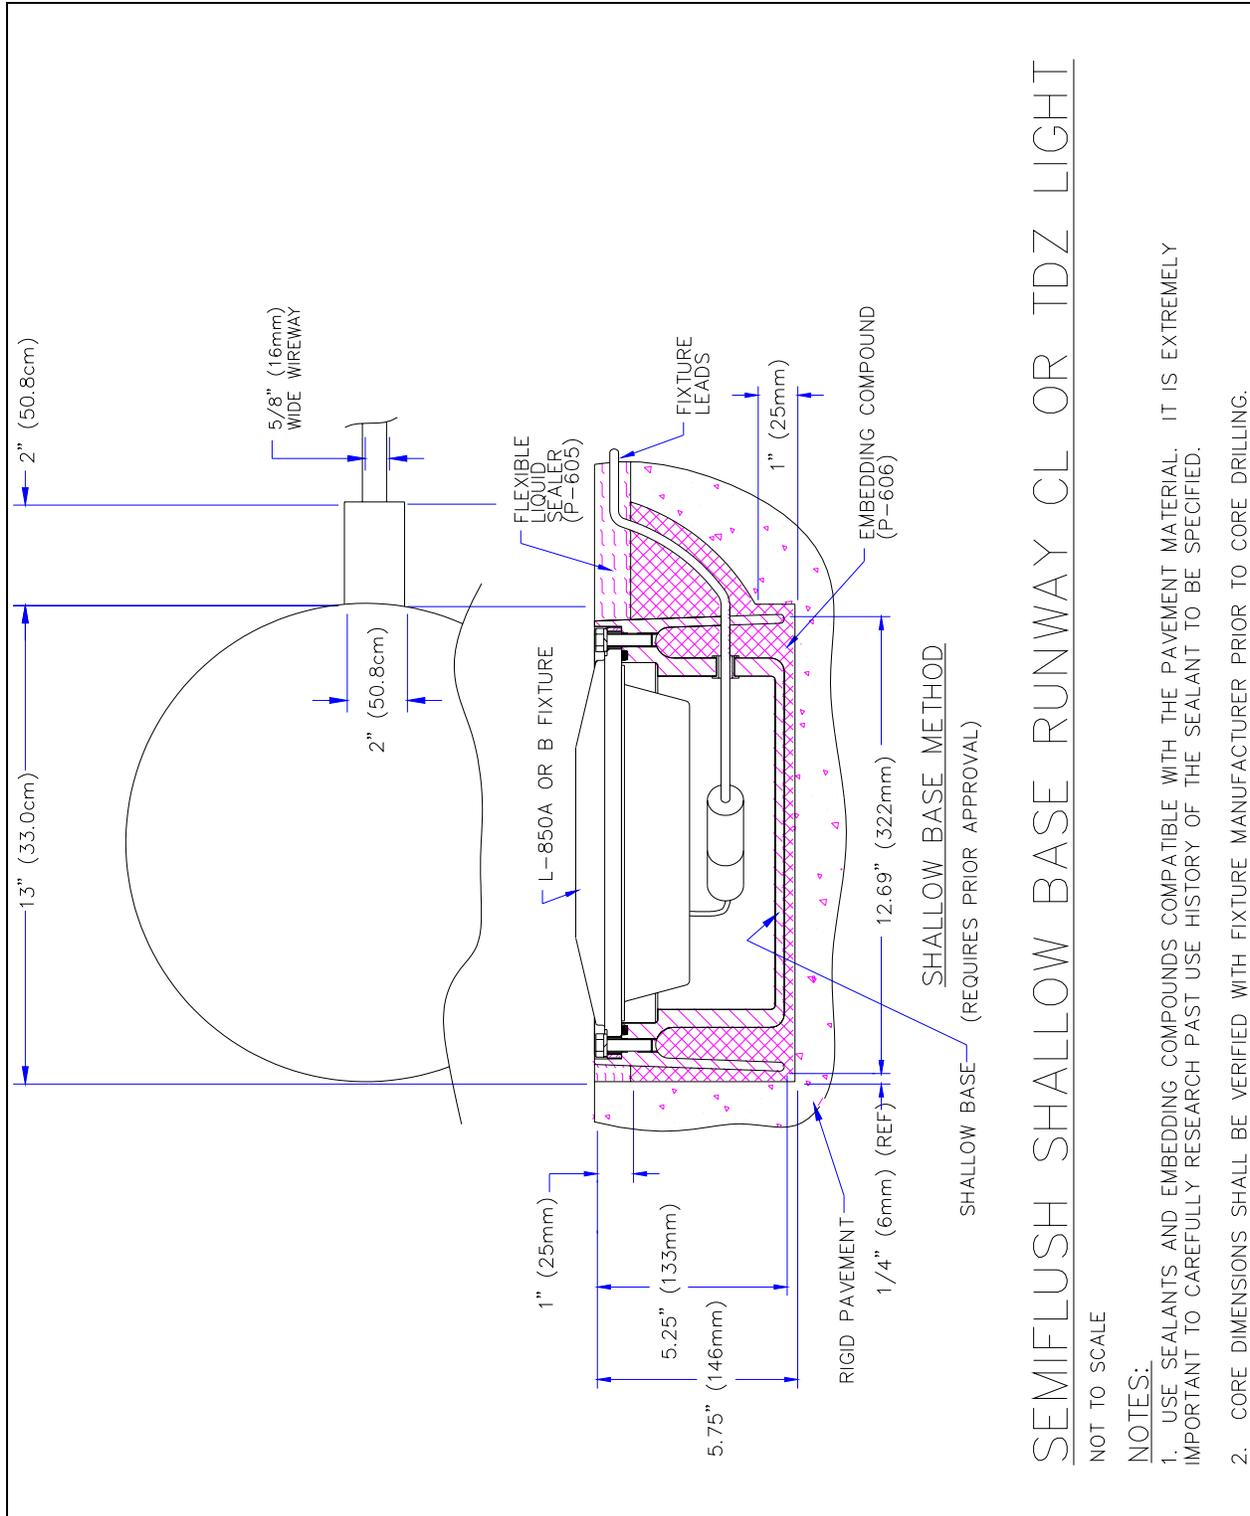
In-pavement Shallow Base Runway Centerline or TDZ Light
